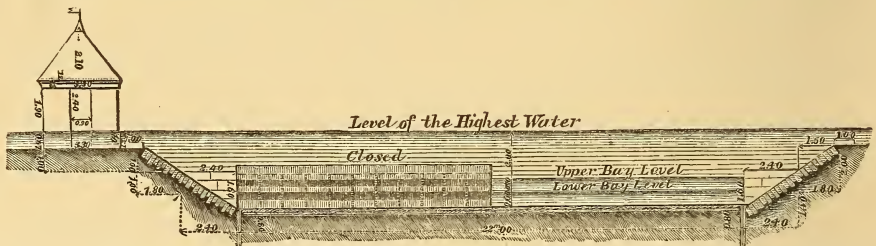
Elevation of the Basseville barrage, showing half the barrage closed with the fermettes raised, and the other half open, with the fermettes lowered.
